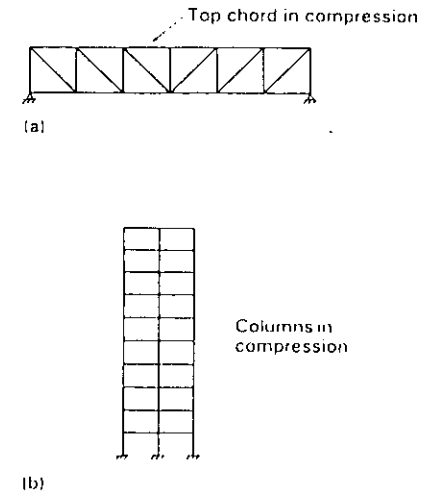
Examples of compression members: (a) compression members in a truss; (b) compression members in a building frame.
